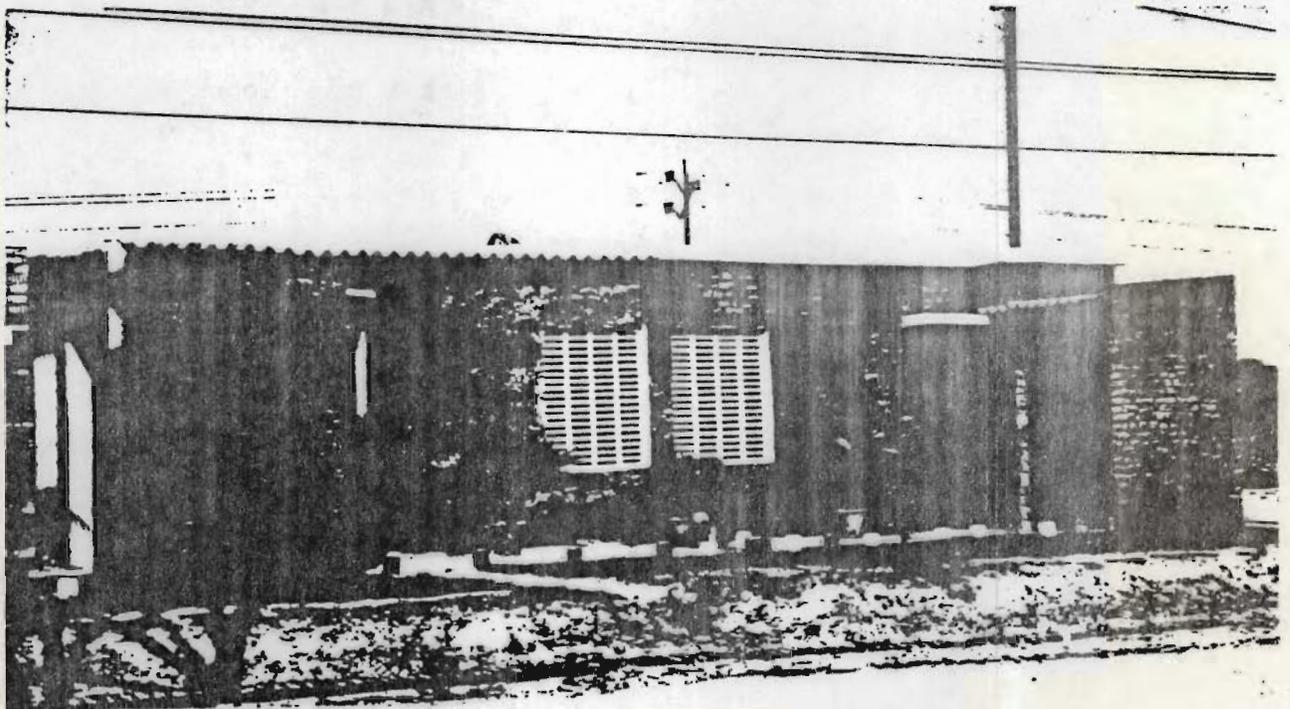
Left Unit: Basic Service Core Unit with Sundried Brick Walls and Asbestos Cement Roofing (R5,753). Right Unit: Pucca Brick Wall in Mud Mortar with Reinforced Brick Roof (R7,000).
